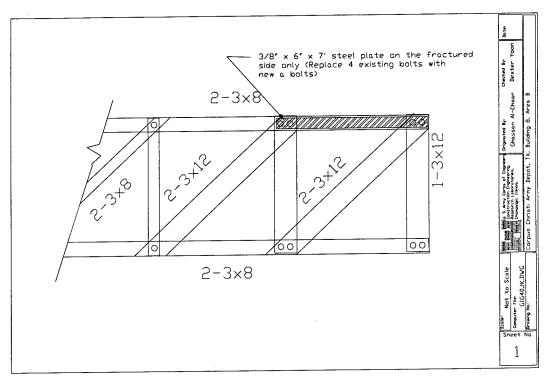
Proposed repair for member JK Truss Column Line 40, Section IG, Area B.
